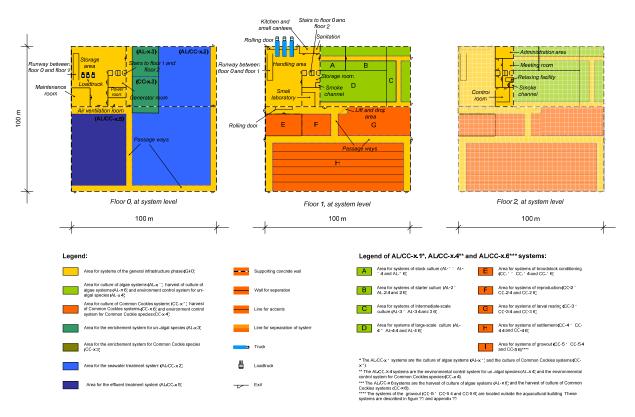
Floor plan of the physical architecture of the aquacultural building at system level.
